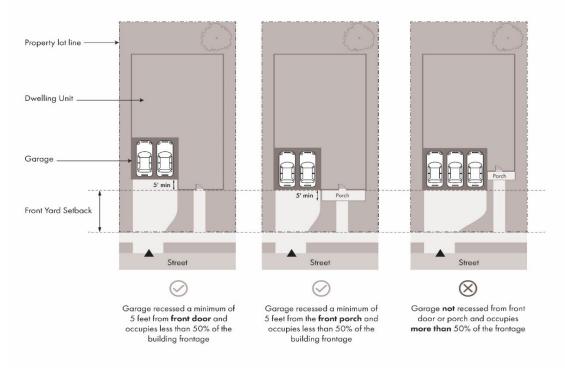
H: IF A GARAGE DOOR FACES THE STREET, THE FRONT PLANE OF THE GARAGE SHALL BE SETBACK FROM THE FRONT PORCH OR PATIO AND OCCUPY NO MORE THAN 50% OF THE BUILDING FRONTAGE
